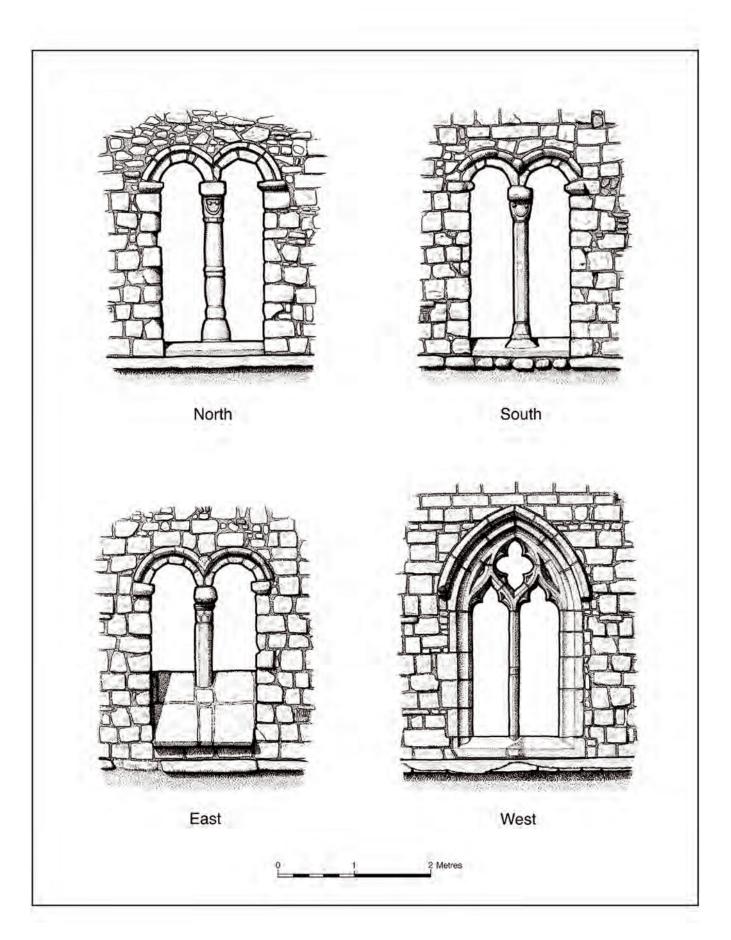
Tower, Stage 3. External elevations of the belfry openings. Scale 1:50. Drawing: Simon Hayfield
